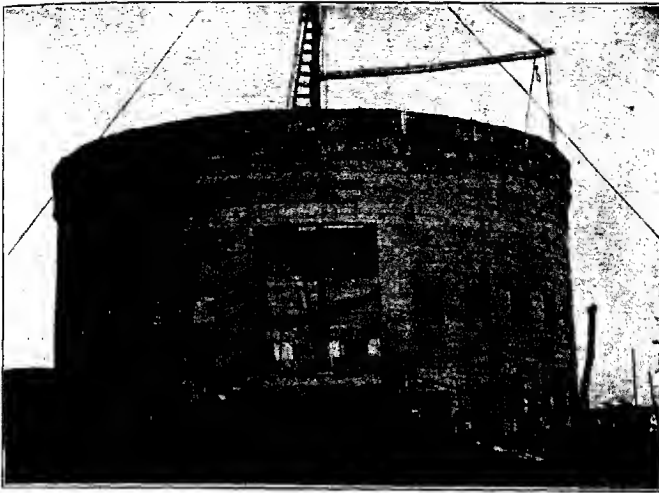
A ROUND DAIRY BARN SIXTY FEET IN DIAMETER; MONOLITHIC CONCRETE CONSTRUCTION
